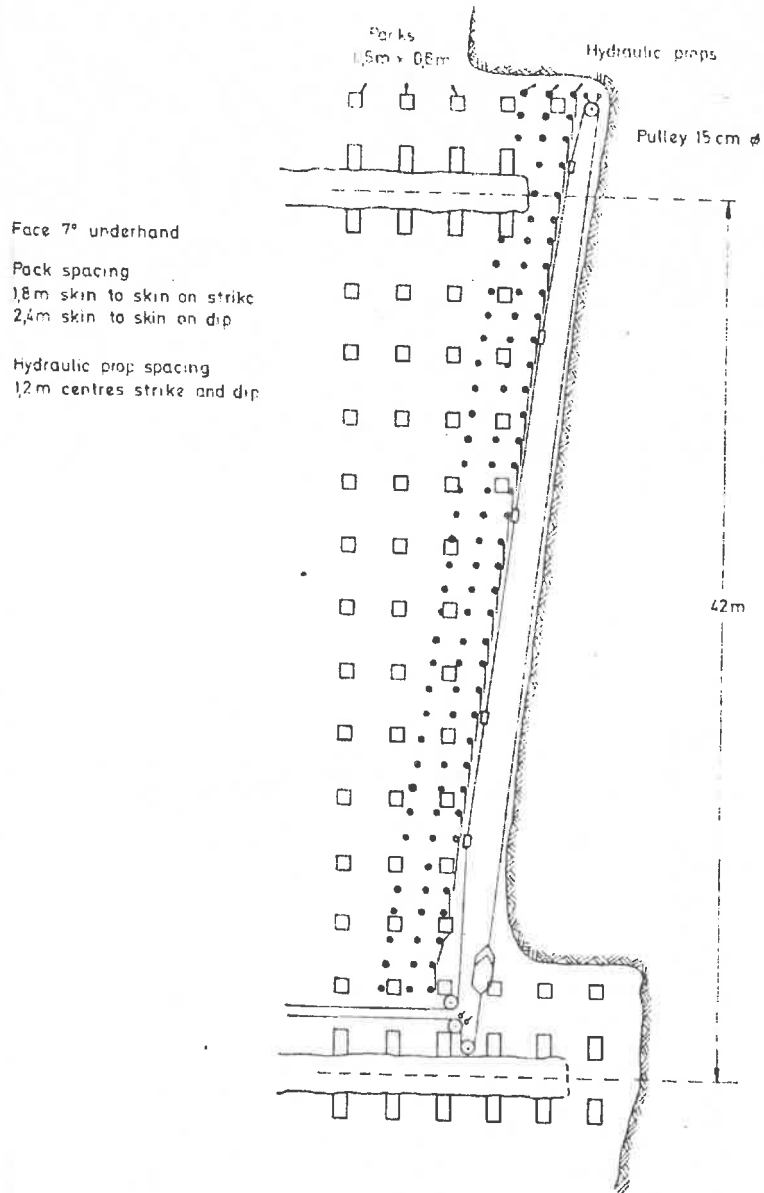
A PLAN SHOWING A TYPICAL PANEL LAYOUT FOR SHORT HOLE BLASTING EXPERIMENTS, INCLUDING THE POSITIONING OF BOTH SCRAPER ROPES ON THE FACE SIDE OF THE BARRICADE AND THE RETURN SNATCH-BLOCK CHAIN ANCHORS
